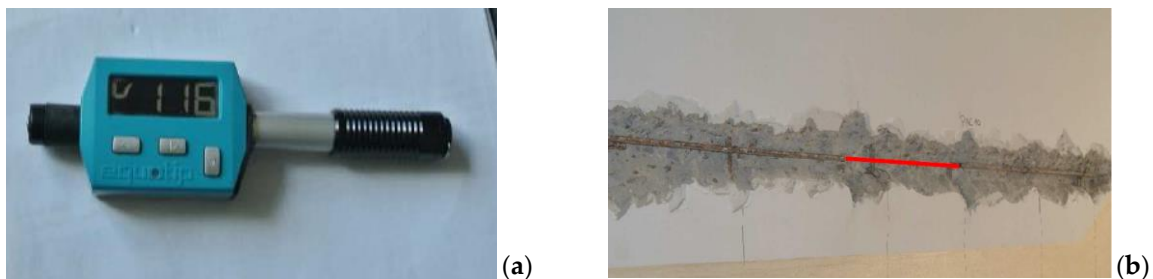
Tests on the reinforcing steel bars: a microdurometer used in the tests (a); a steel bar of a ground storey wall before the extraction of a portion, highlighted in red (b).
